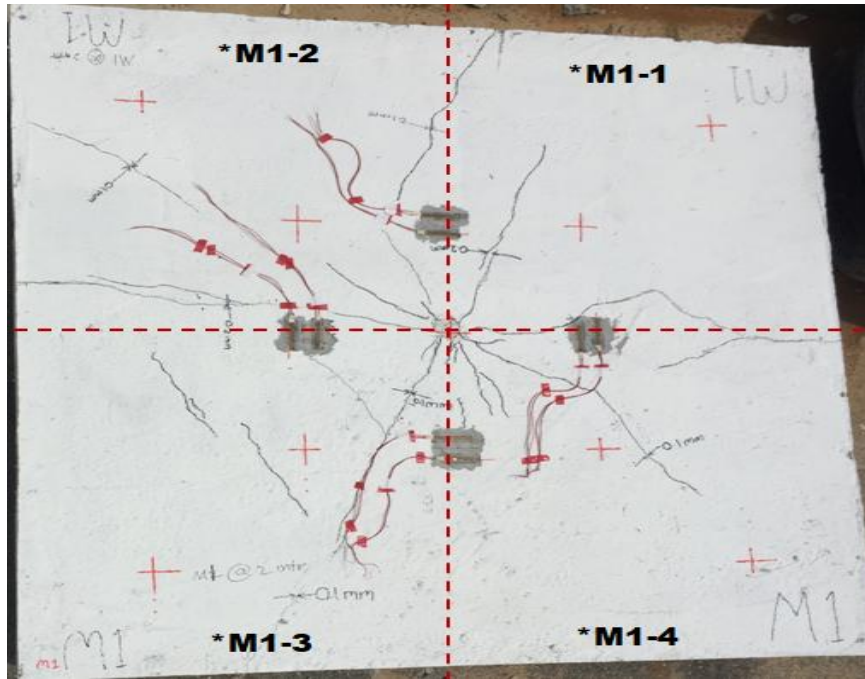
Failure for Slab Specimen M1 (2m drop) – another plan view
